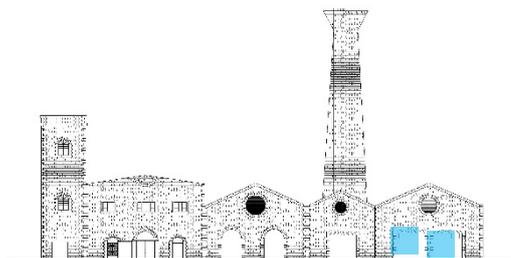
Concrete - South-east elevation, openings on Barrack D, 15 to 17A, East Wharf, KPT, Karachi.
